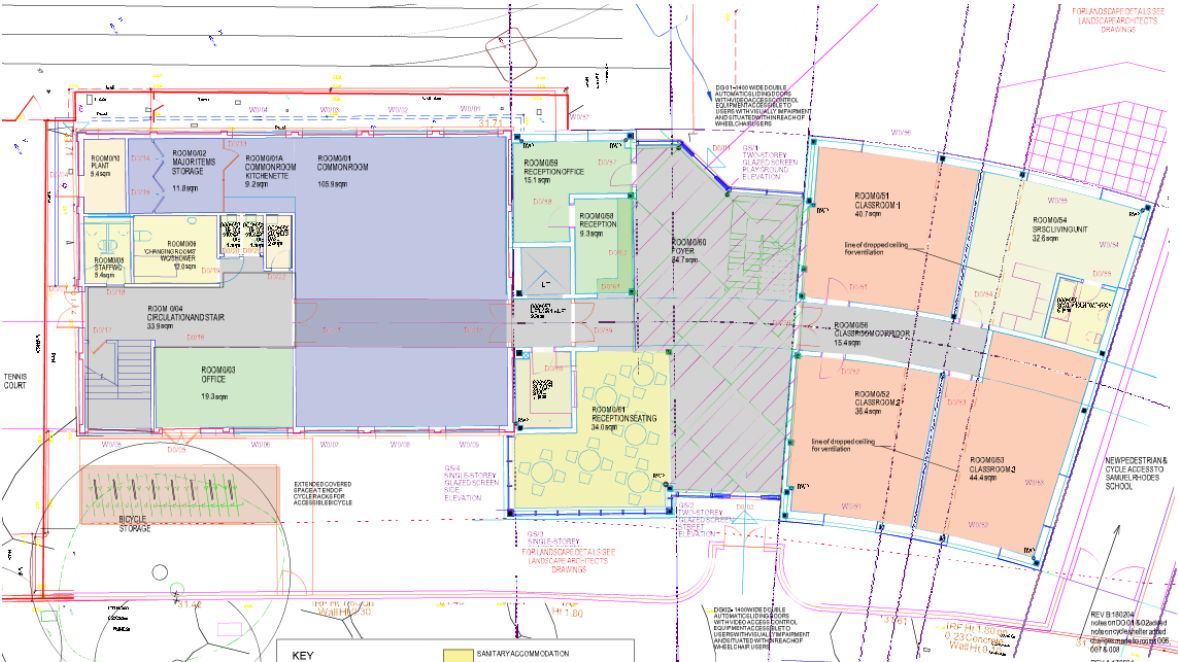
Proposed Ground Floor Plan showing difference in building line (3.5m)
